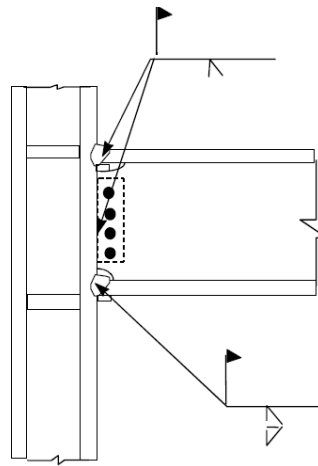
Pre-Northridge welded-flange-bolted-web connection detail (FEMA 351, 2000).
